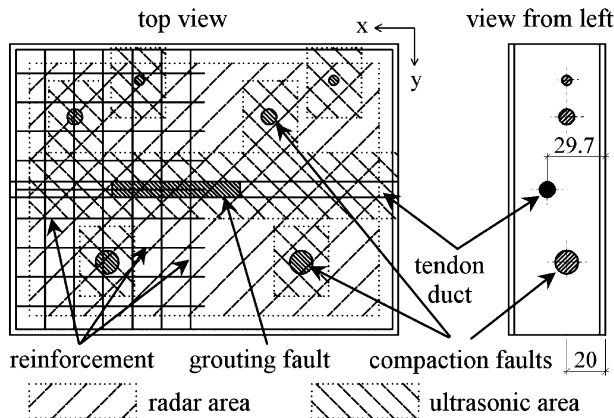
Views of the concrete test specimen no. 2, size 2.0 m × 1.5 m × 0.5 m.
